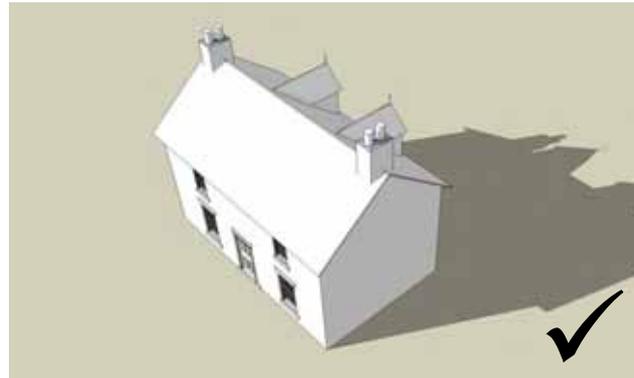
Where possible dormer windows and veluxes should be located on rear elevations.
